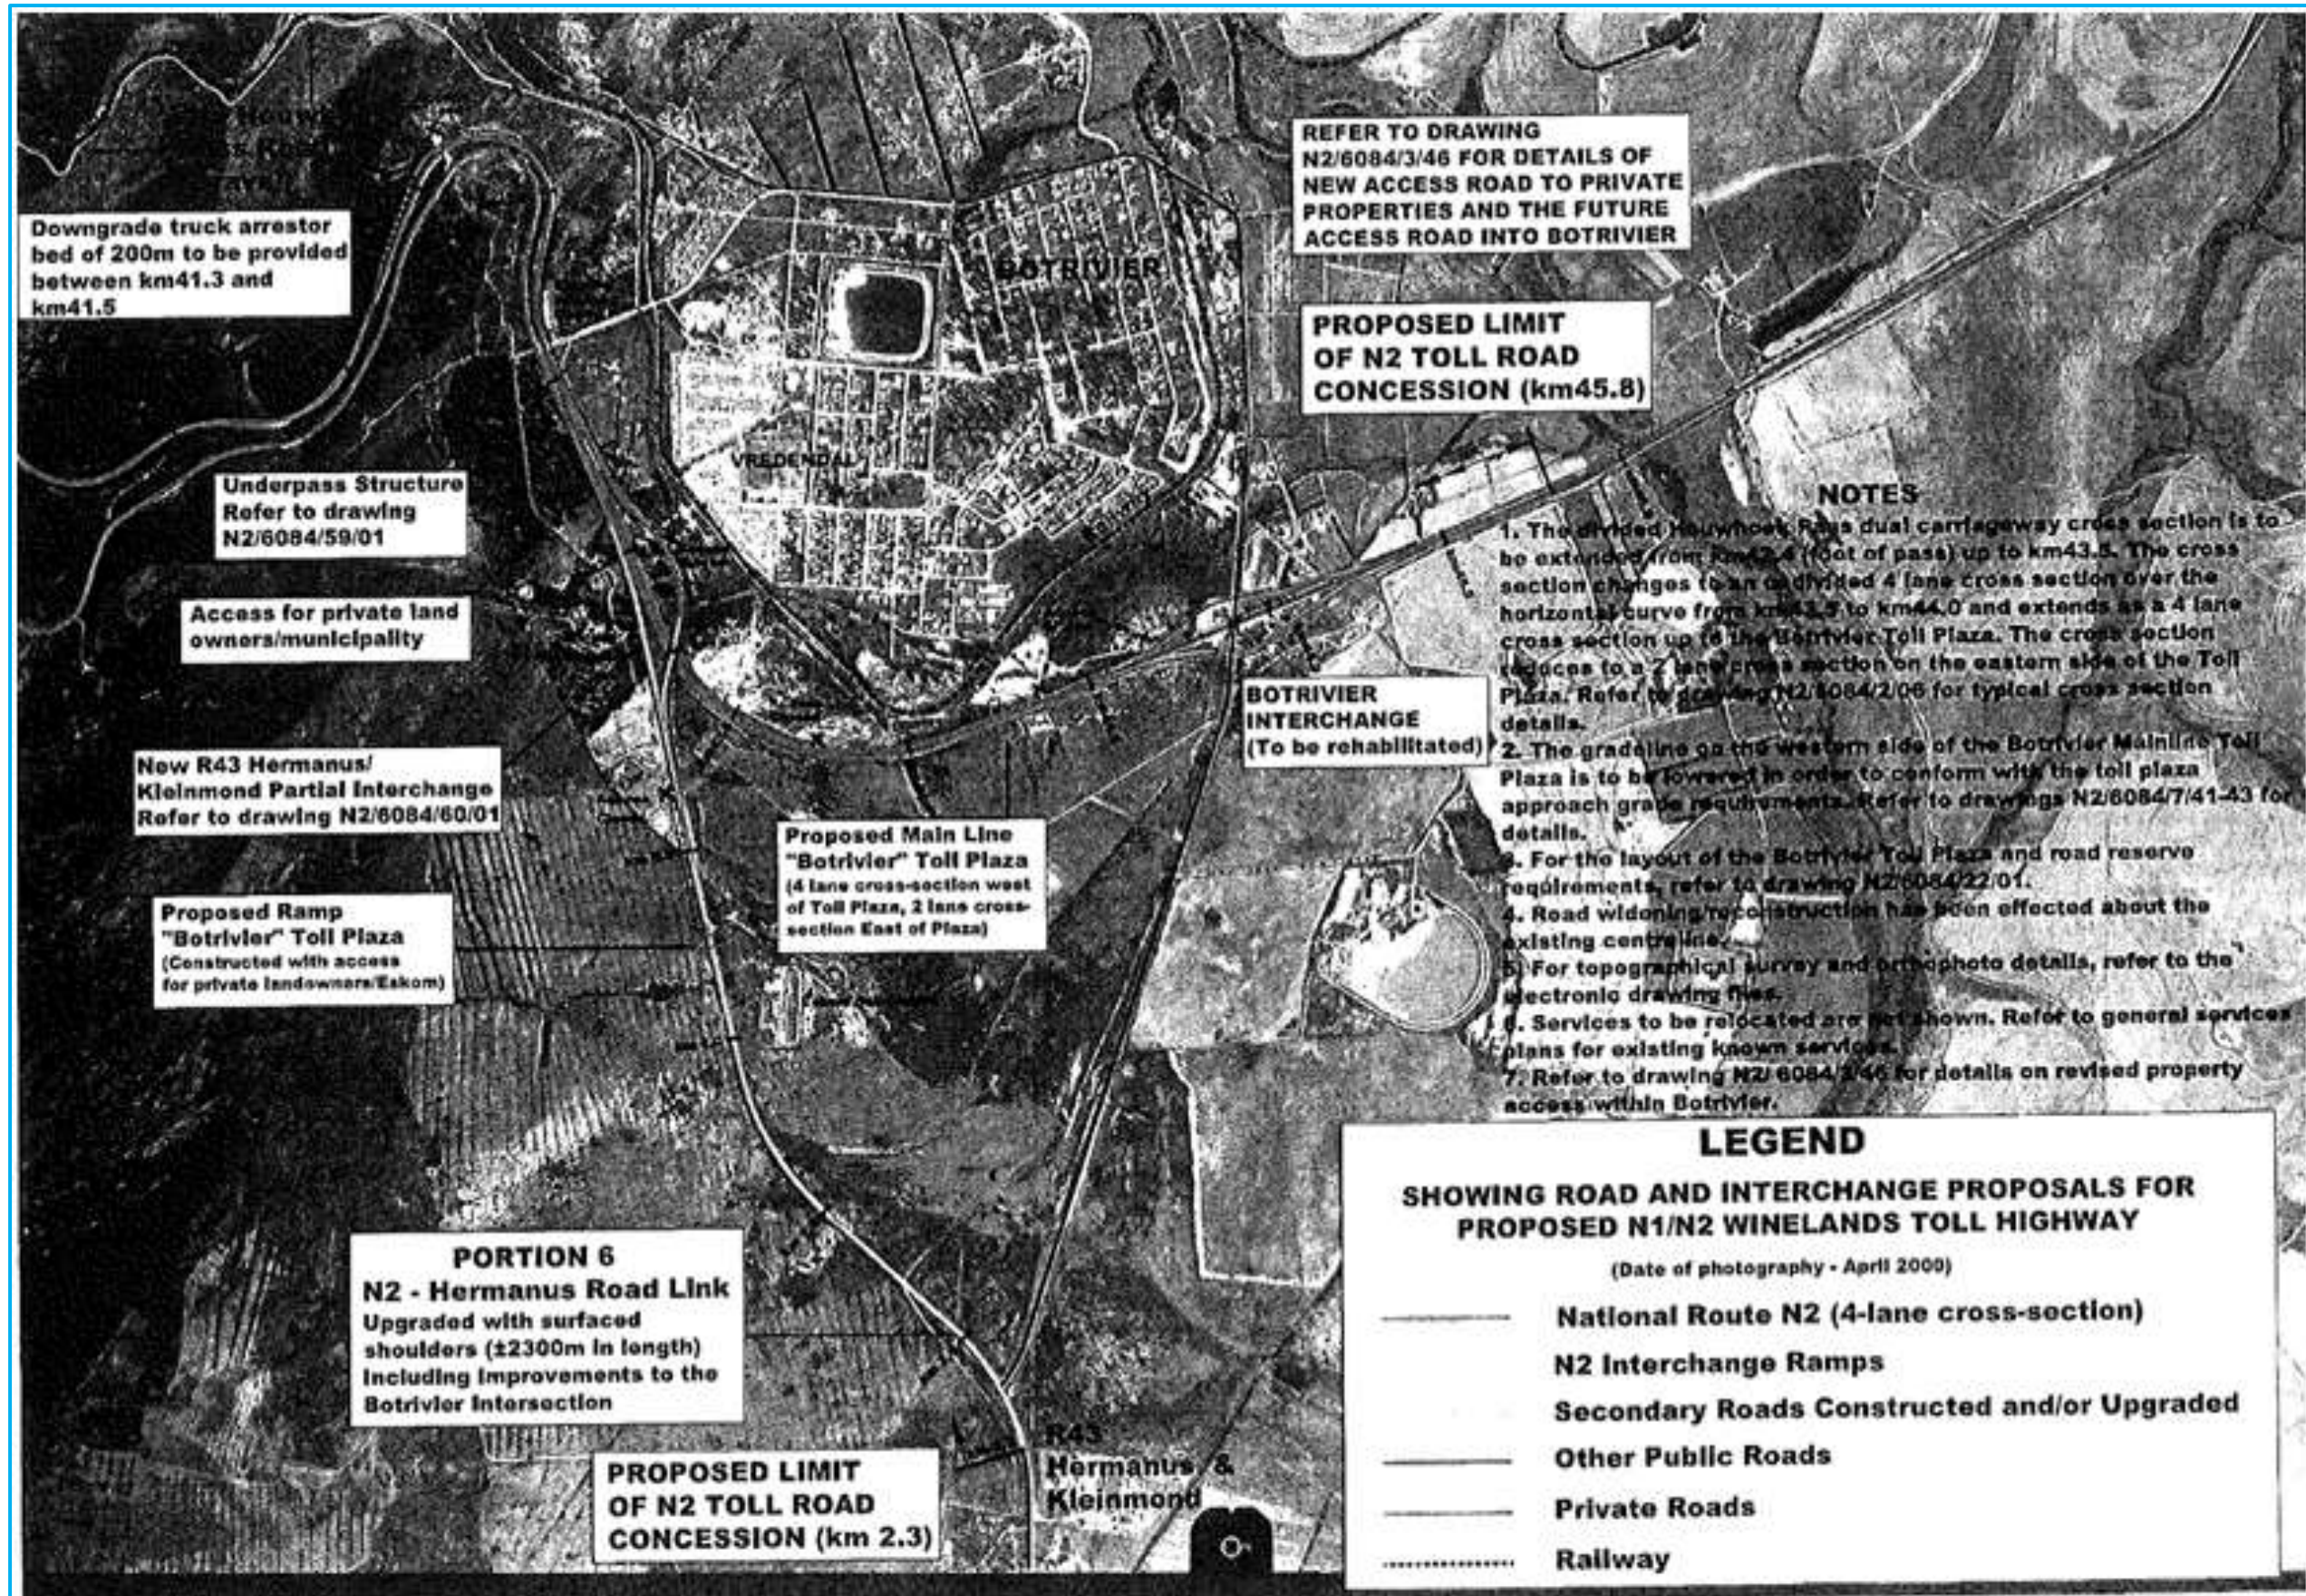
Planned Road Network Improvements (N2 Toll Consortium)
